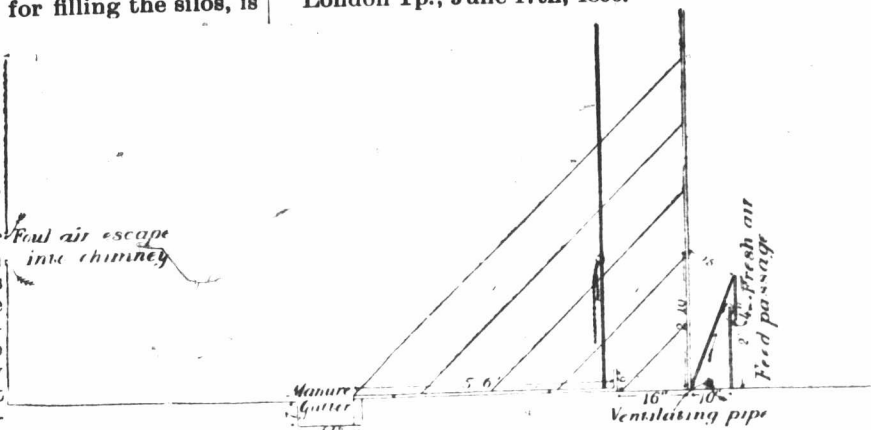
FIG. III.—CROSS-SECTION OF STALL, SHOWING THE PLAN OF VENTILATION.
